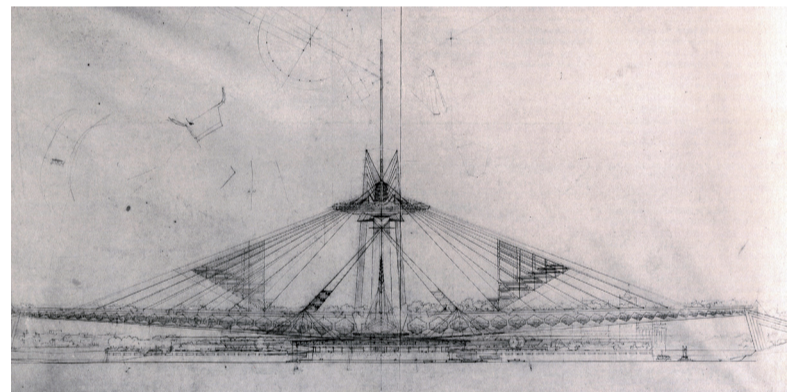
Front Elevation of Wright's Twin Suspension Bridges. 1948.
